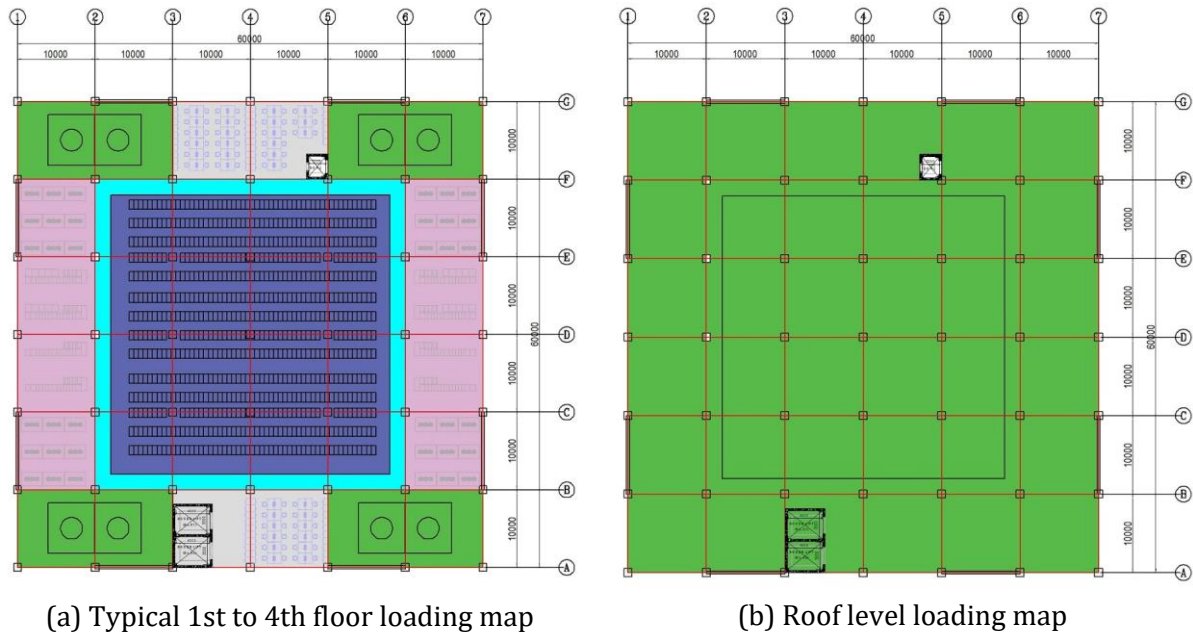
Spatial distribution of design loads applied to the structural models: (a) typical 1st to 4th floor; (b) roof level
